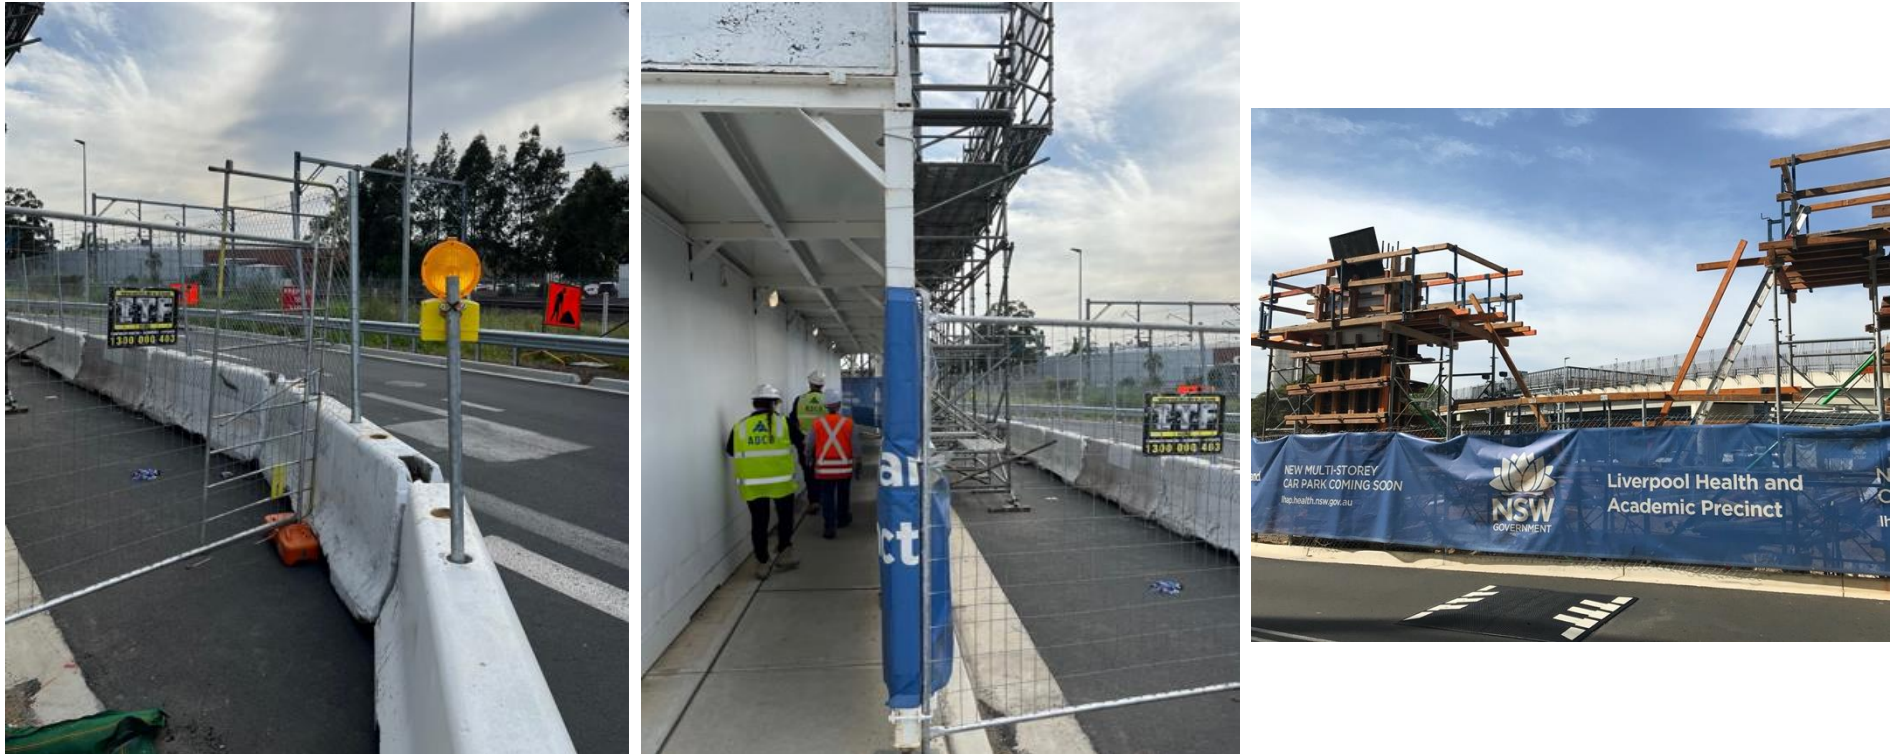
Hoardings, fencing and jersey barriers installed to separate pedestrians from construction areas and traffic.
